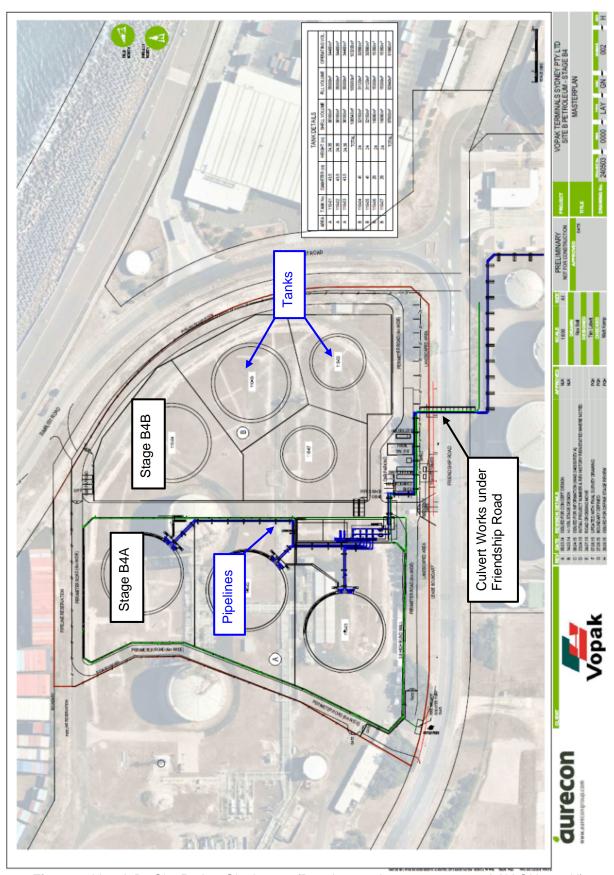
Vopak B4 Site Project Site Layout (Drawing number: 240503-0000-LAY-GN-002-H)
